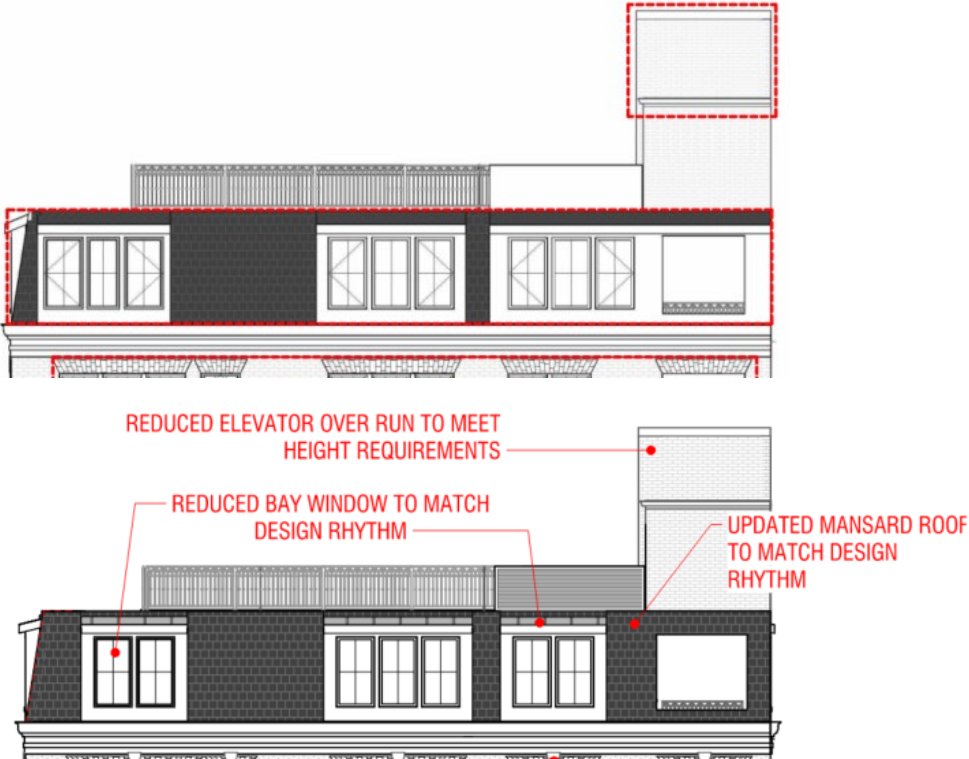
Previous (top) and revised (bottom) west elevation of fifth floor
